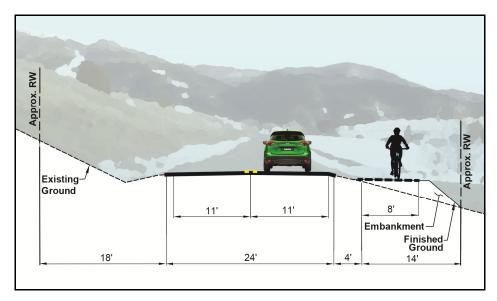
Sypes Canyon Road looking east (typical section N1-g).
